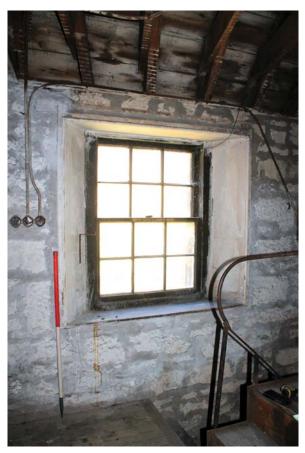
Room 1/2, detail of the stairwell window in the north wall from the SSW
